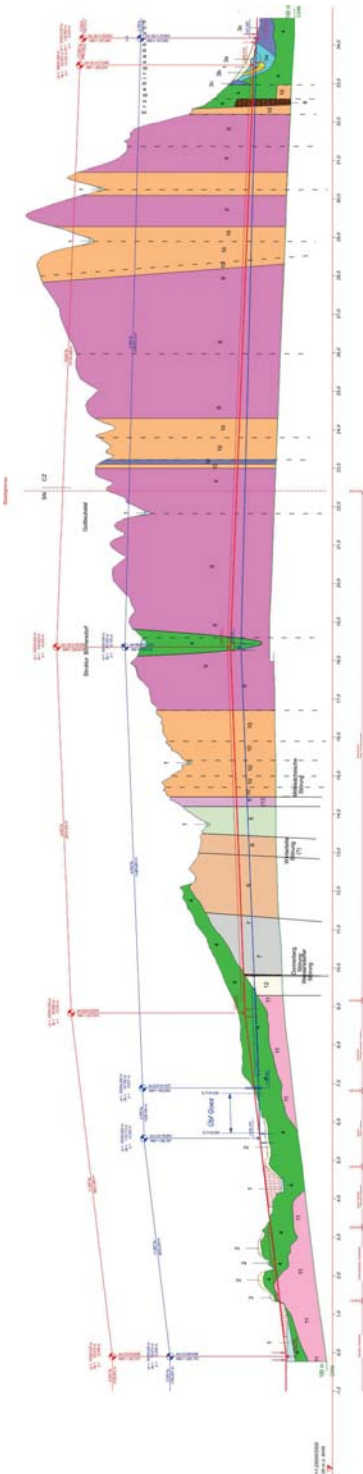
Longitudinal Section – cross border tunnel / Source: SMWA 2015
